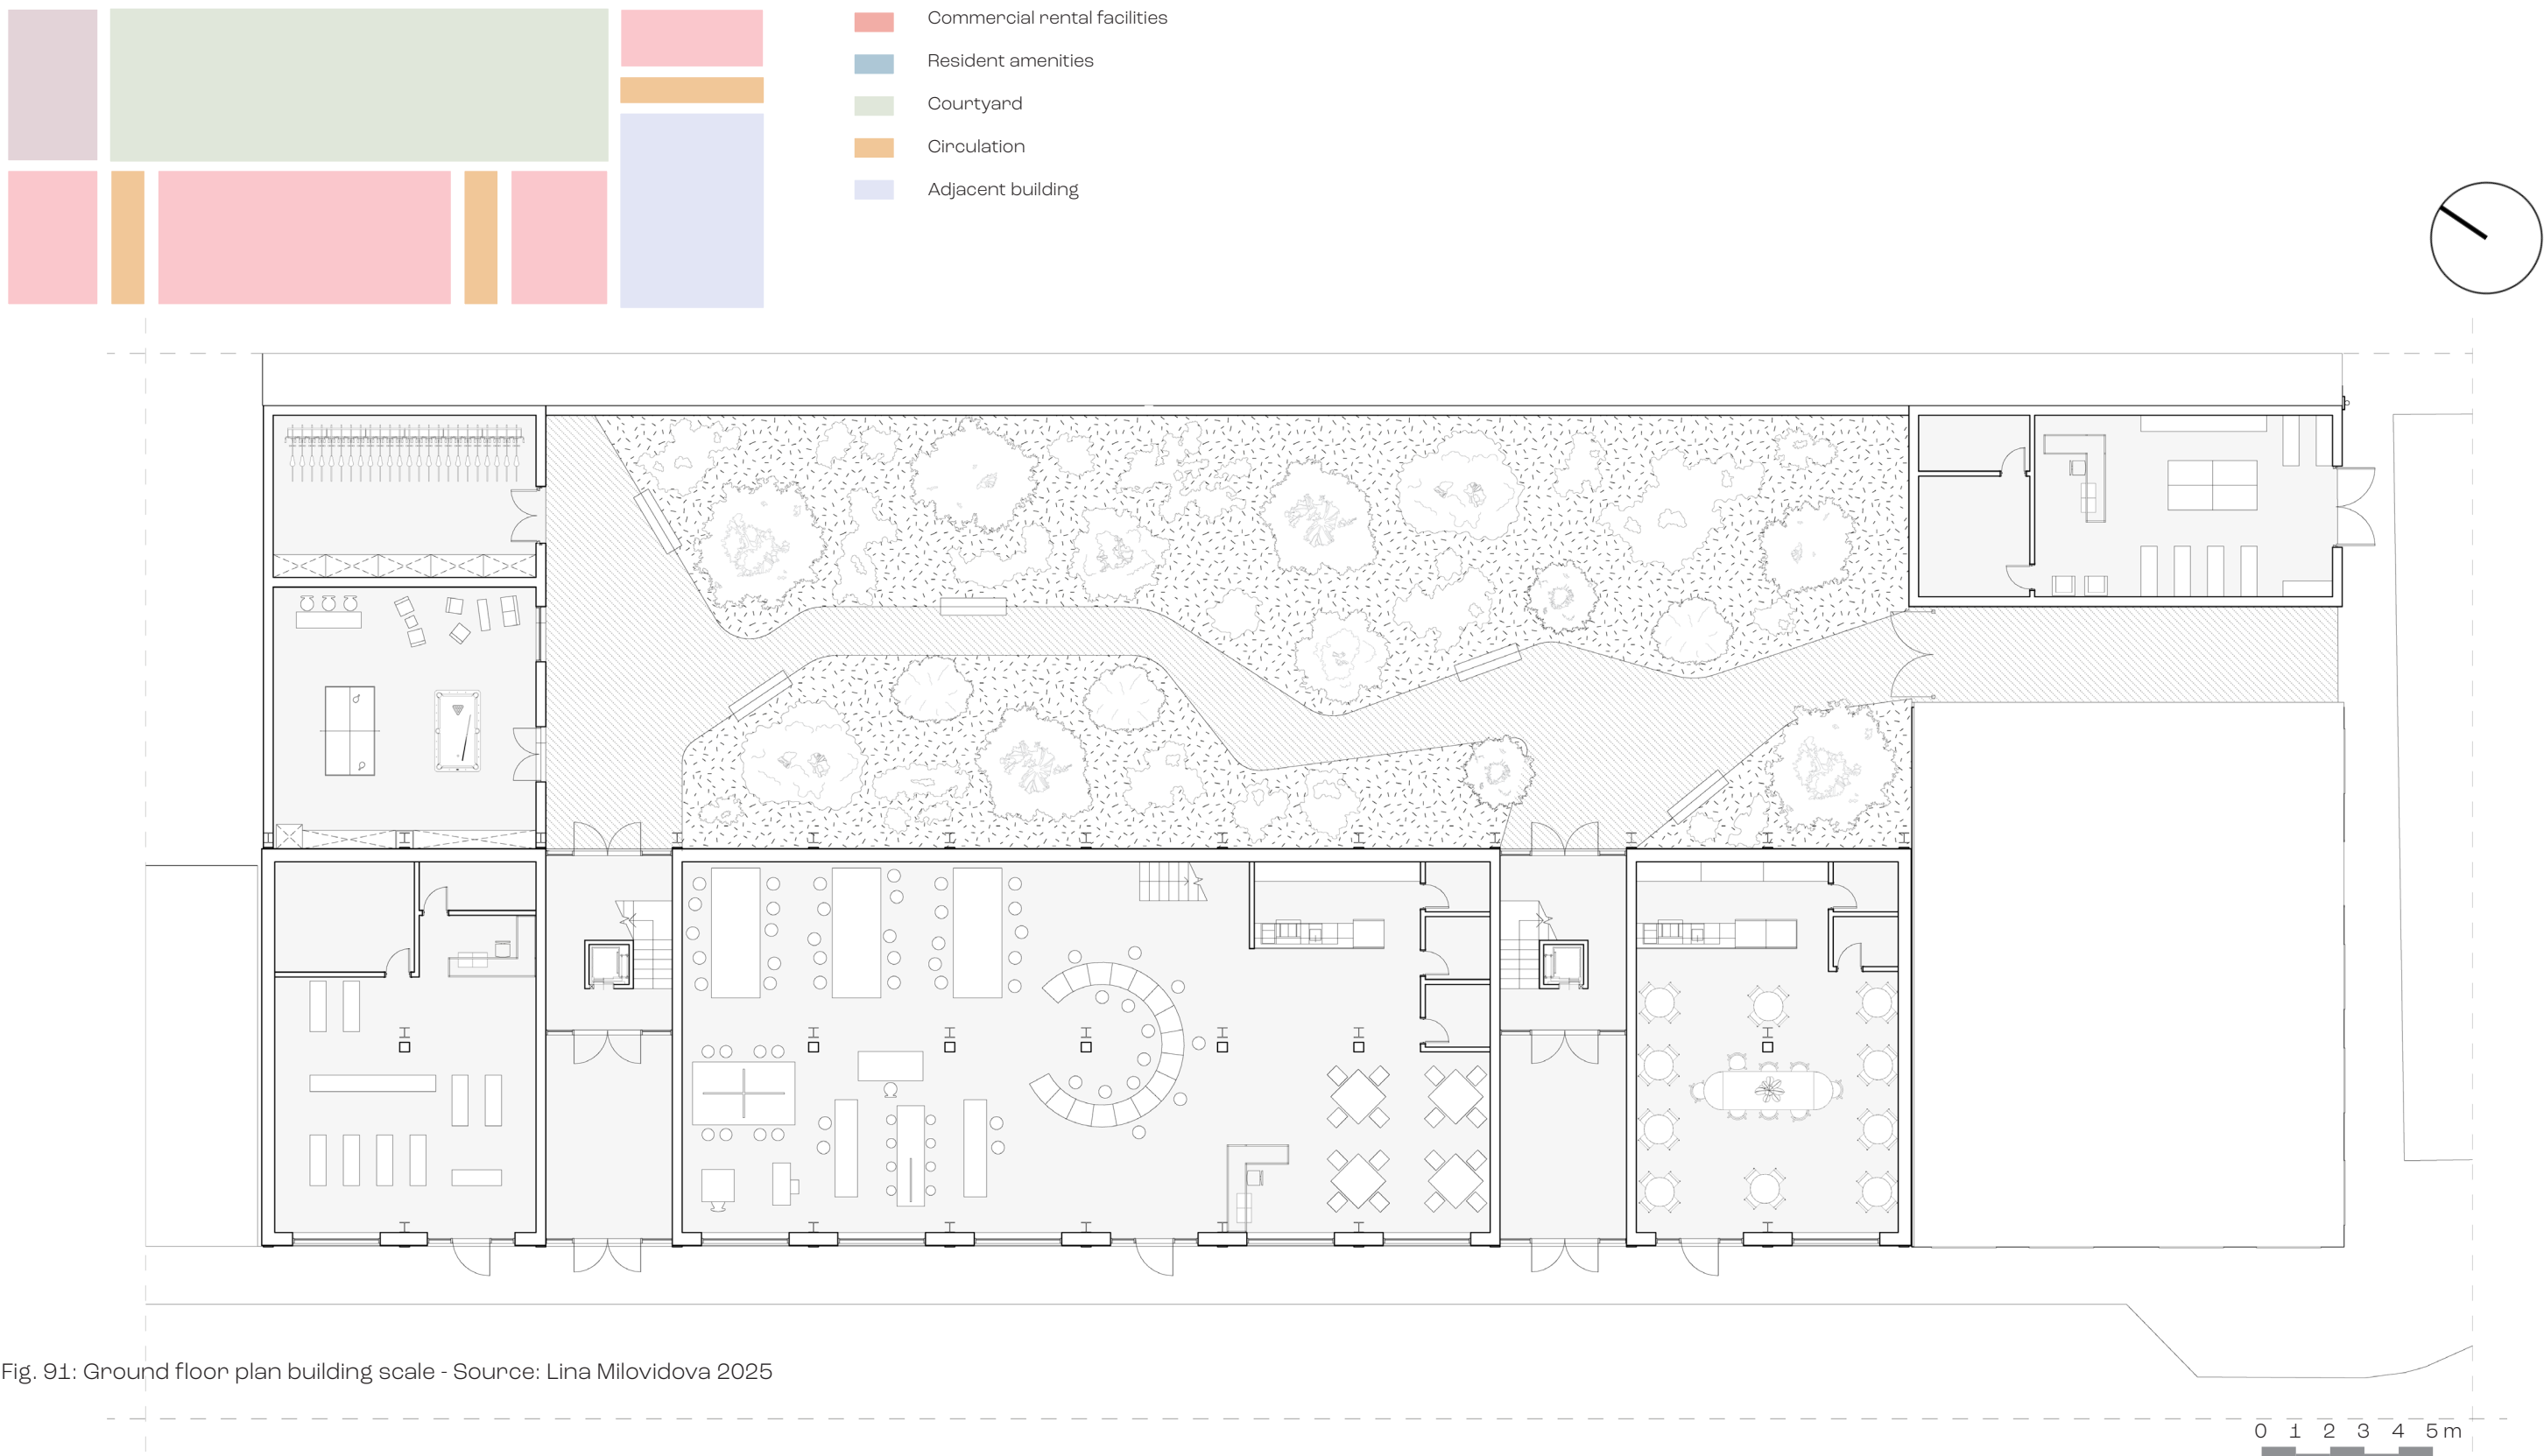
Ground floor plan building scale - Source: Lina Milovidova 2025
